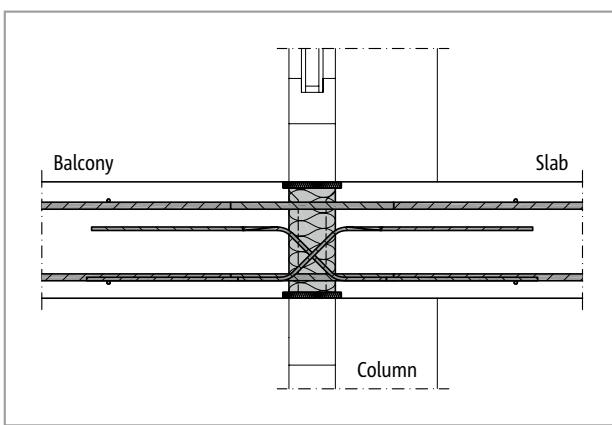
Schöck Isokorb® T type D: Installation section; one-way spanning
